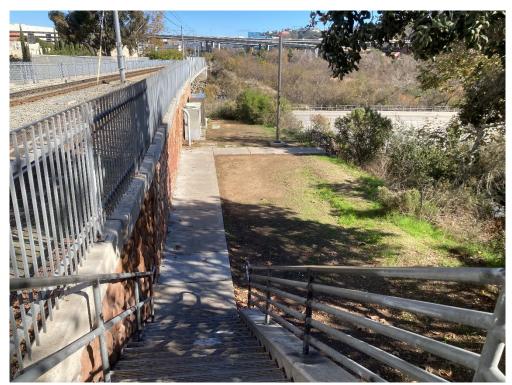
View of pathway south of the Platform and the southeastern section of the PAL, photo facing east.
